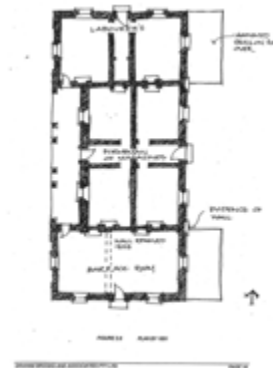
ASSUMED 1891 PLAN OF THE BARRACKS
